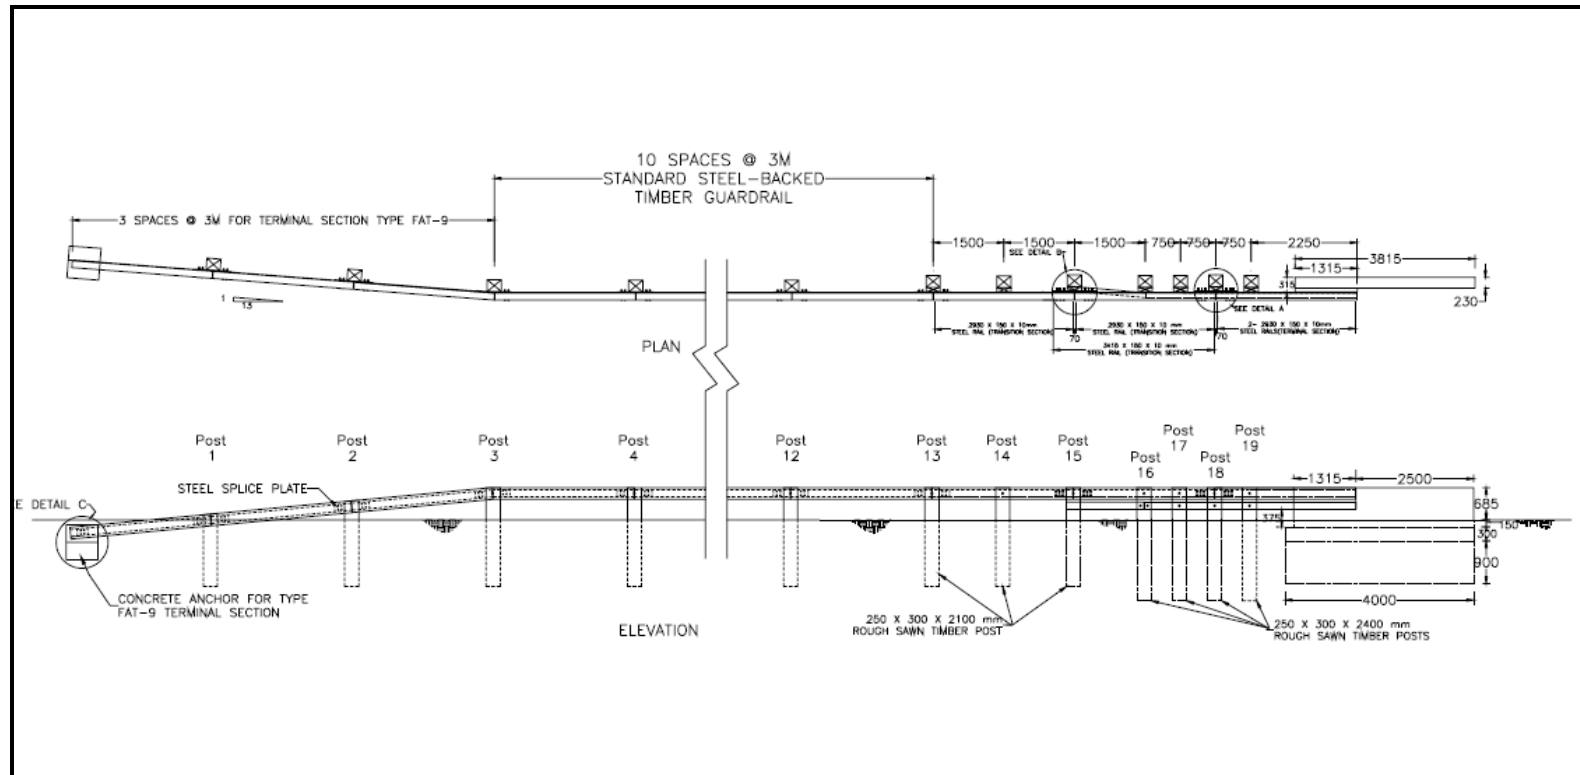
Layout of Type B Steel-Backed Timber Guardrail
